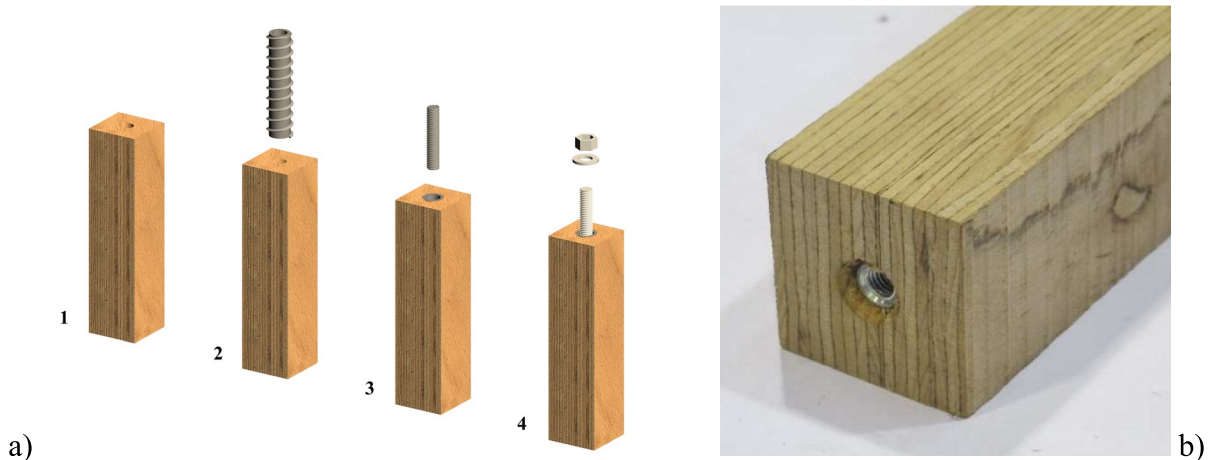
Type D connection: a assembly stages and b specimen before screwing of axial threaded rod
